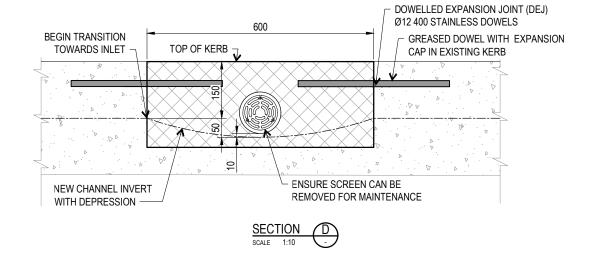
TYPE 'D' (LAYBACK) KERB INLET
